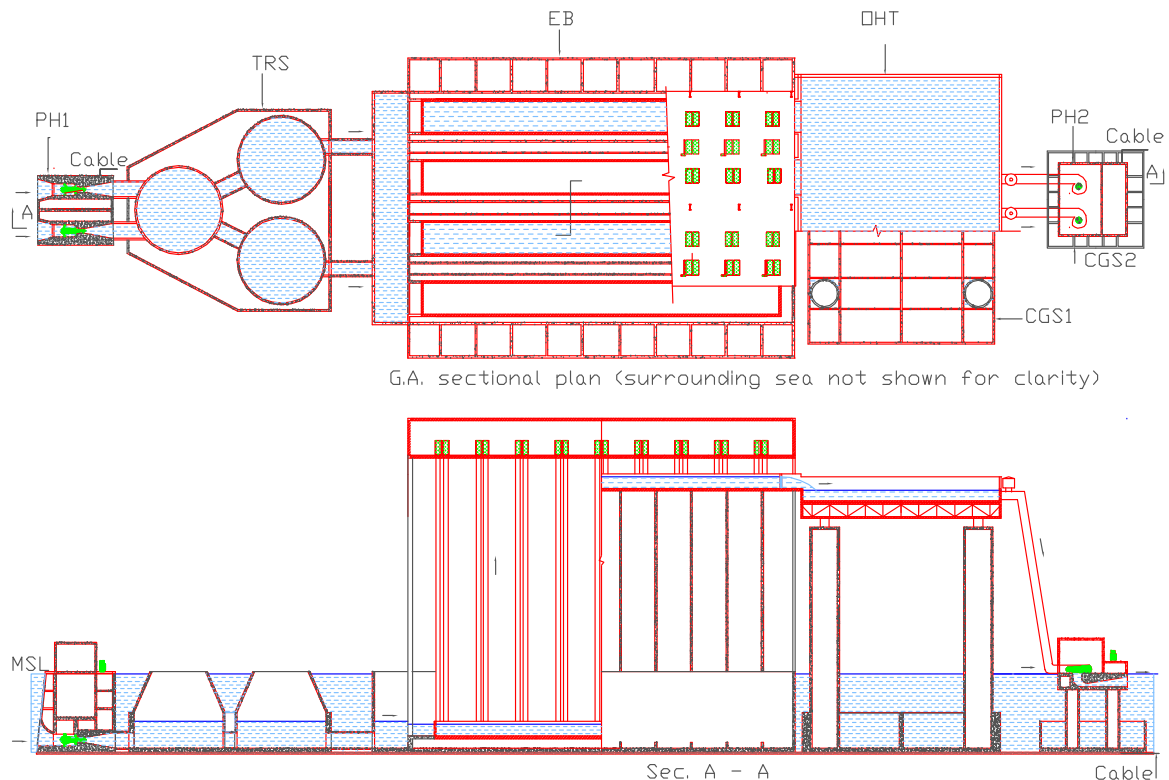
G.A. plan and longitudinal section of Offshore Hydroelectric Plant.
